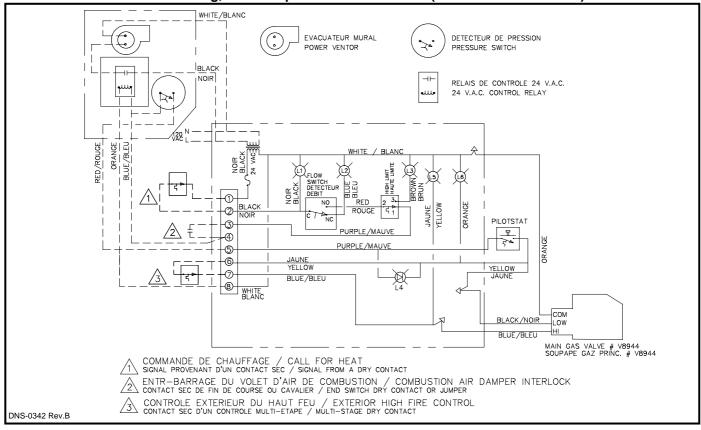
Electrical wiring, constant pilot and sidewall vent (HGC 0808 to HGC 1313)
